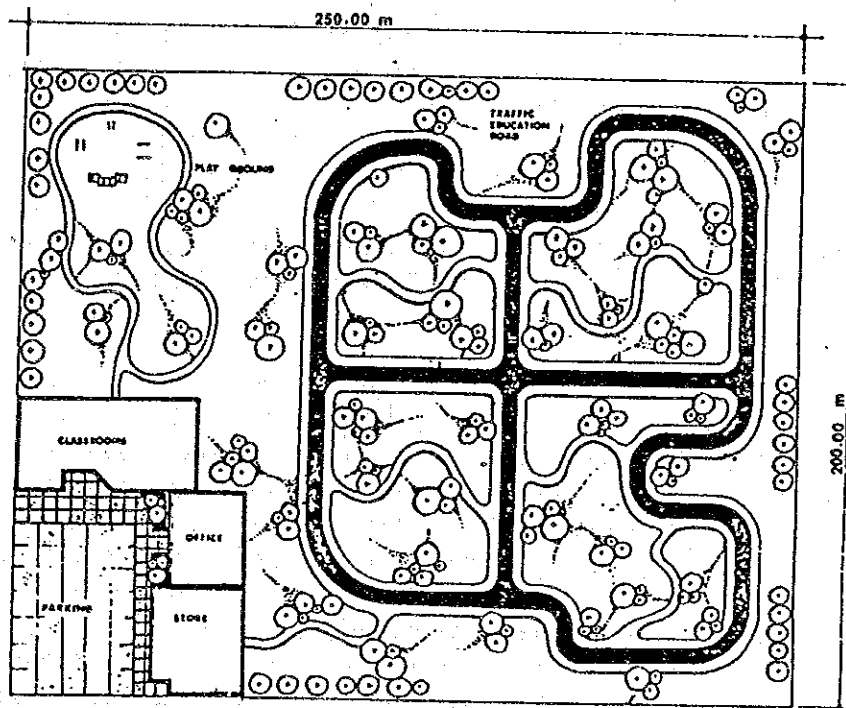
Conceptual Plan of Traffic Safety Park
